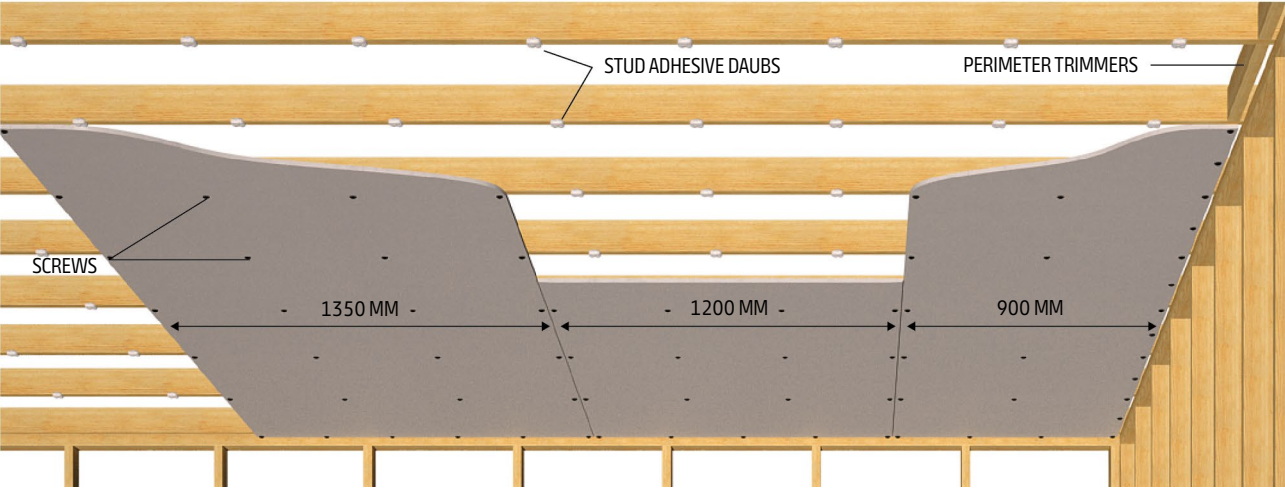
Combination Adhesive and Screw Fixing to Ceilings – Conventional Method
